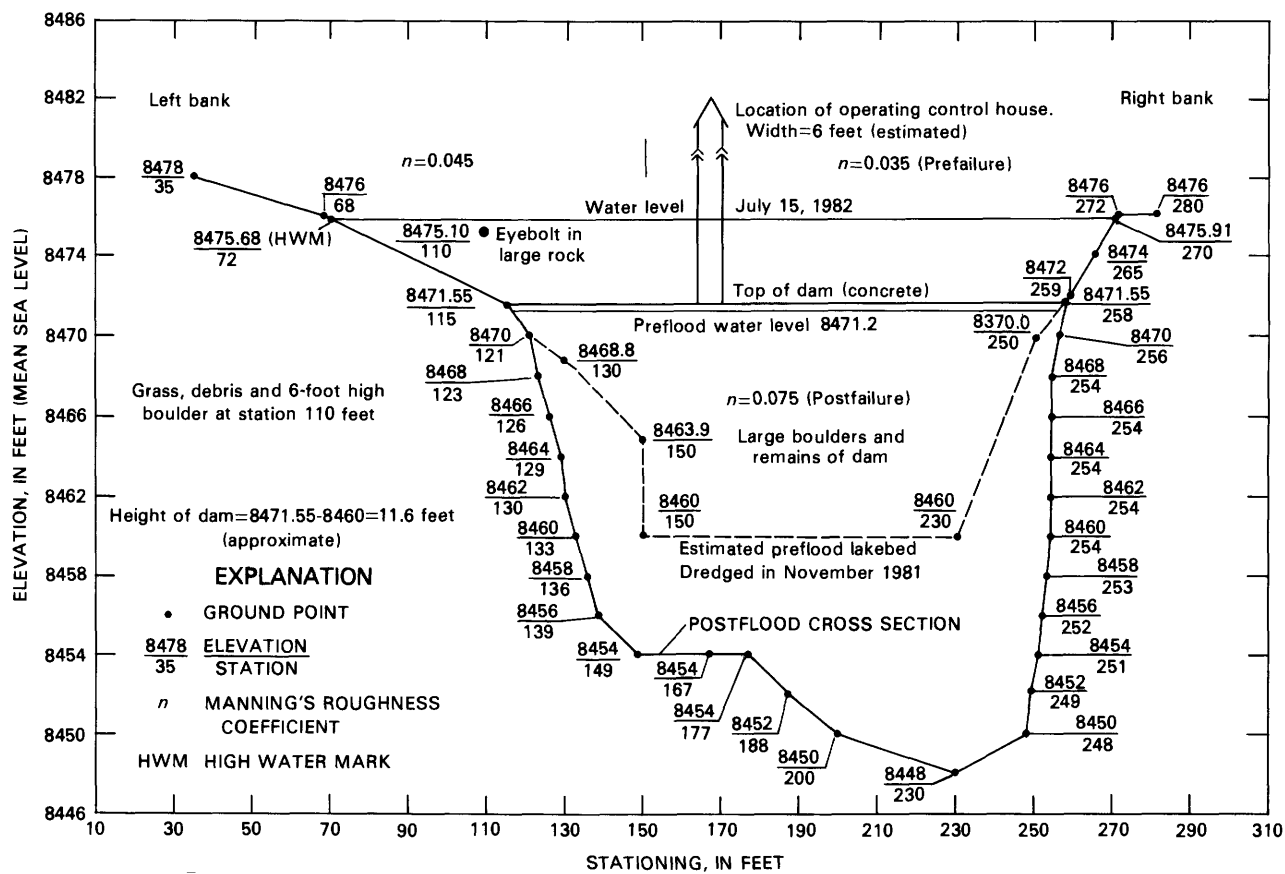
Cascade Lake dam cross sections on the Fall River at river mile 6.67 (site 2).
